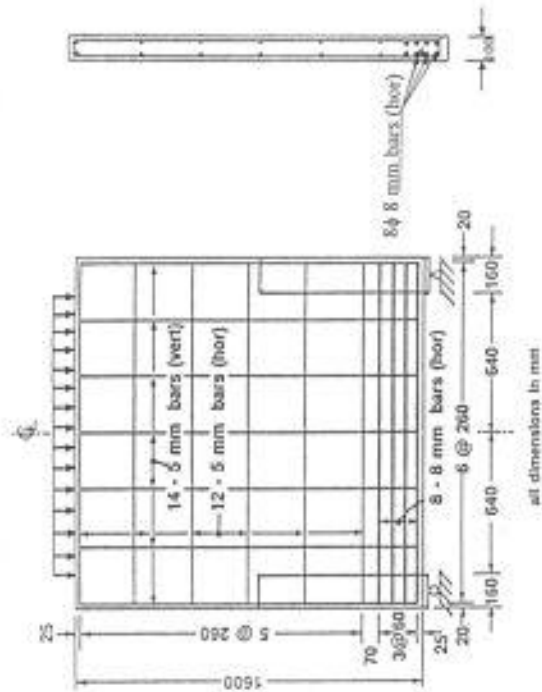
Dimensions, Reinforcement, Loading, and Boundary conditions of Leonhardt and Walther studied deep beam [17]
